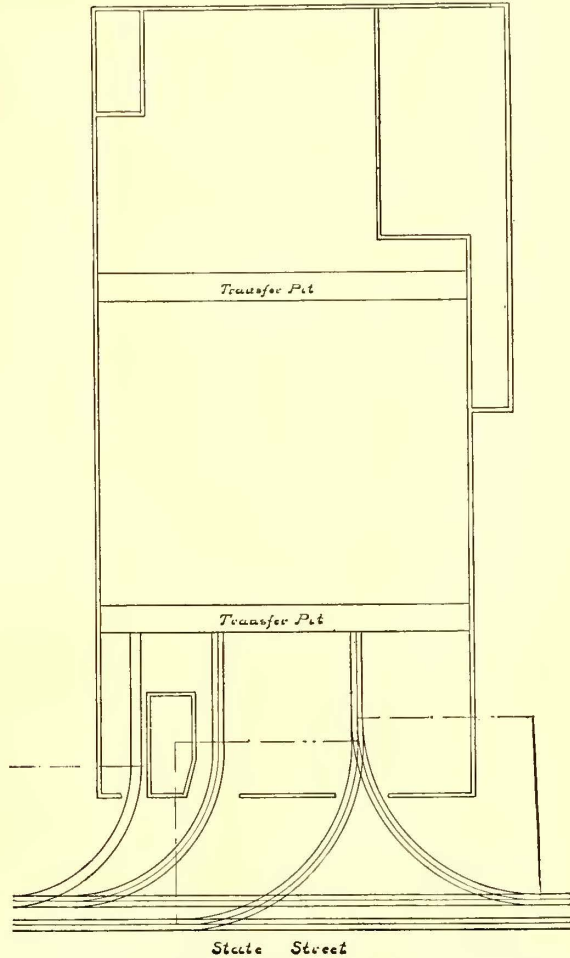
NEW PLAN OF 61ST STREET CAR HOUSE—CHICAGO CITY RAILWAY.
